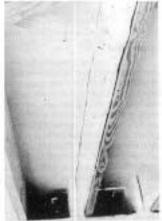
Sandblasting charred lumber and laminating new structural member to old is a cost-effective alternative to replacement of ceiling joists.
